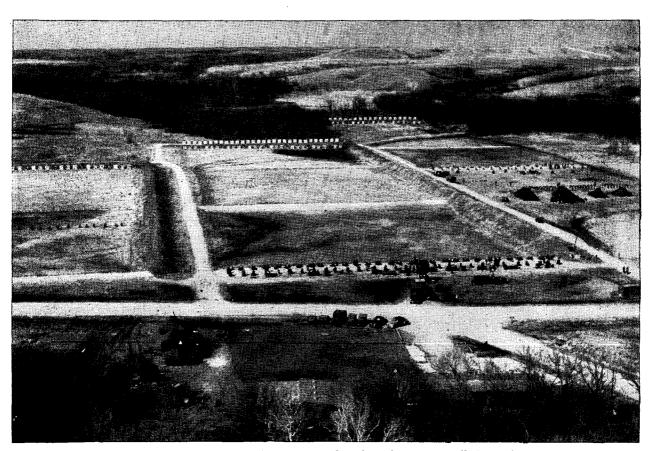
Air view of M1 rifle range, showing excellent location of storage facilities and buildings, instructor's platform, and vehicle parking space. (Detailed construction plans for this type range are shown in fig. 236.)
